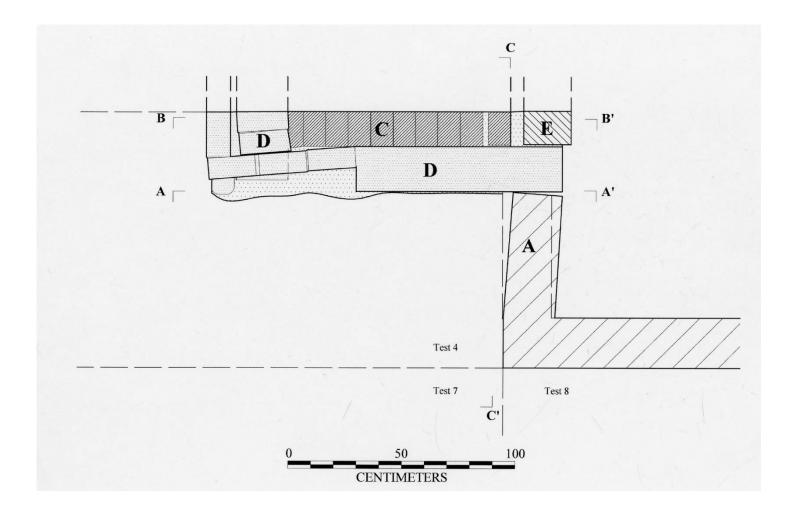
Plan view of House A during mitigation, illustrating the bulkhead entrance located at the southwest corner of the house. Episodes of construction are indicated as follows: A) original perimeter foundations (Feature 1); C) brick pavement installed within partially infilled bulkhead (Feature 17); D) raised and extended bulkhead wall (Feature 16B); and E) brick infill closing off bulkhead from house (Feature 18). The original section of the bulkhead wall (Feature 16A; "B") is not visible from this perspective. Profile locations also are indicated (A-A', etc.).
